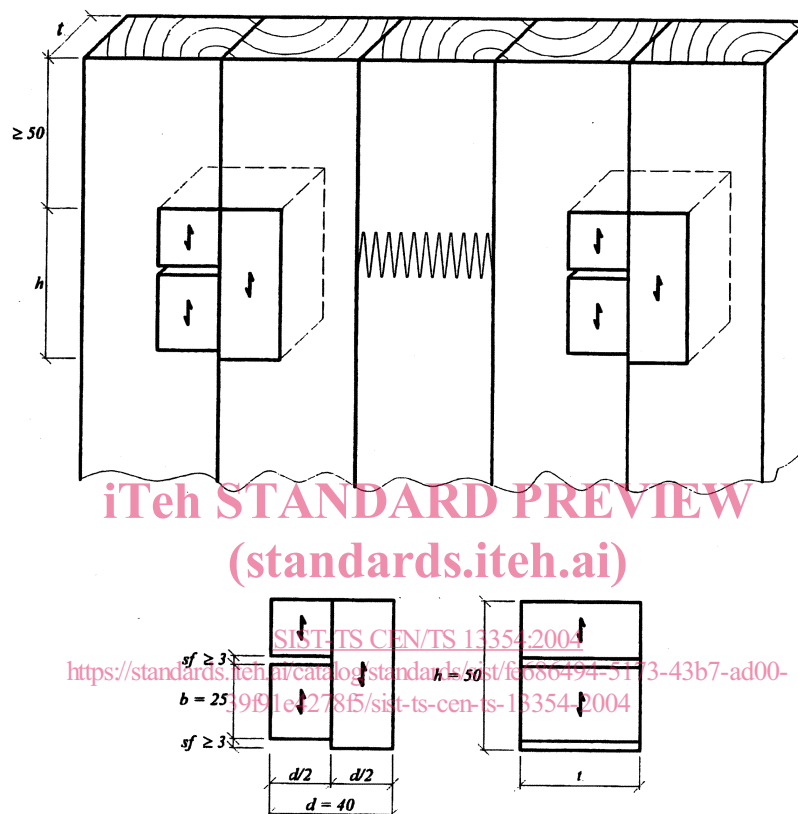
Example for cutting plan for test pieces of a multi-layer solid wood panel
